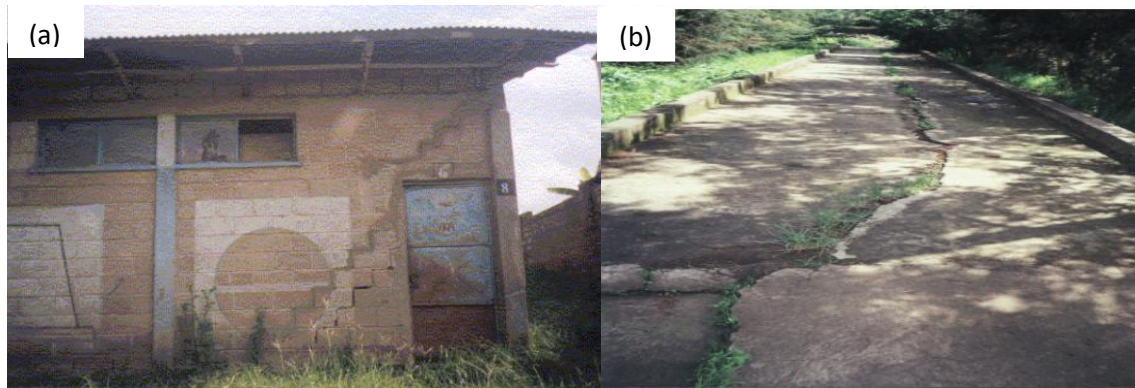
Severe diagonal crack (a) Crack of a walkway(b) (Afewerk, 2004)
